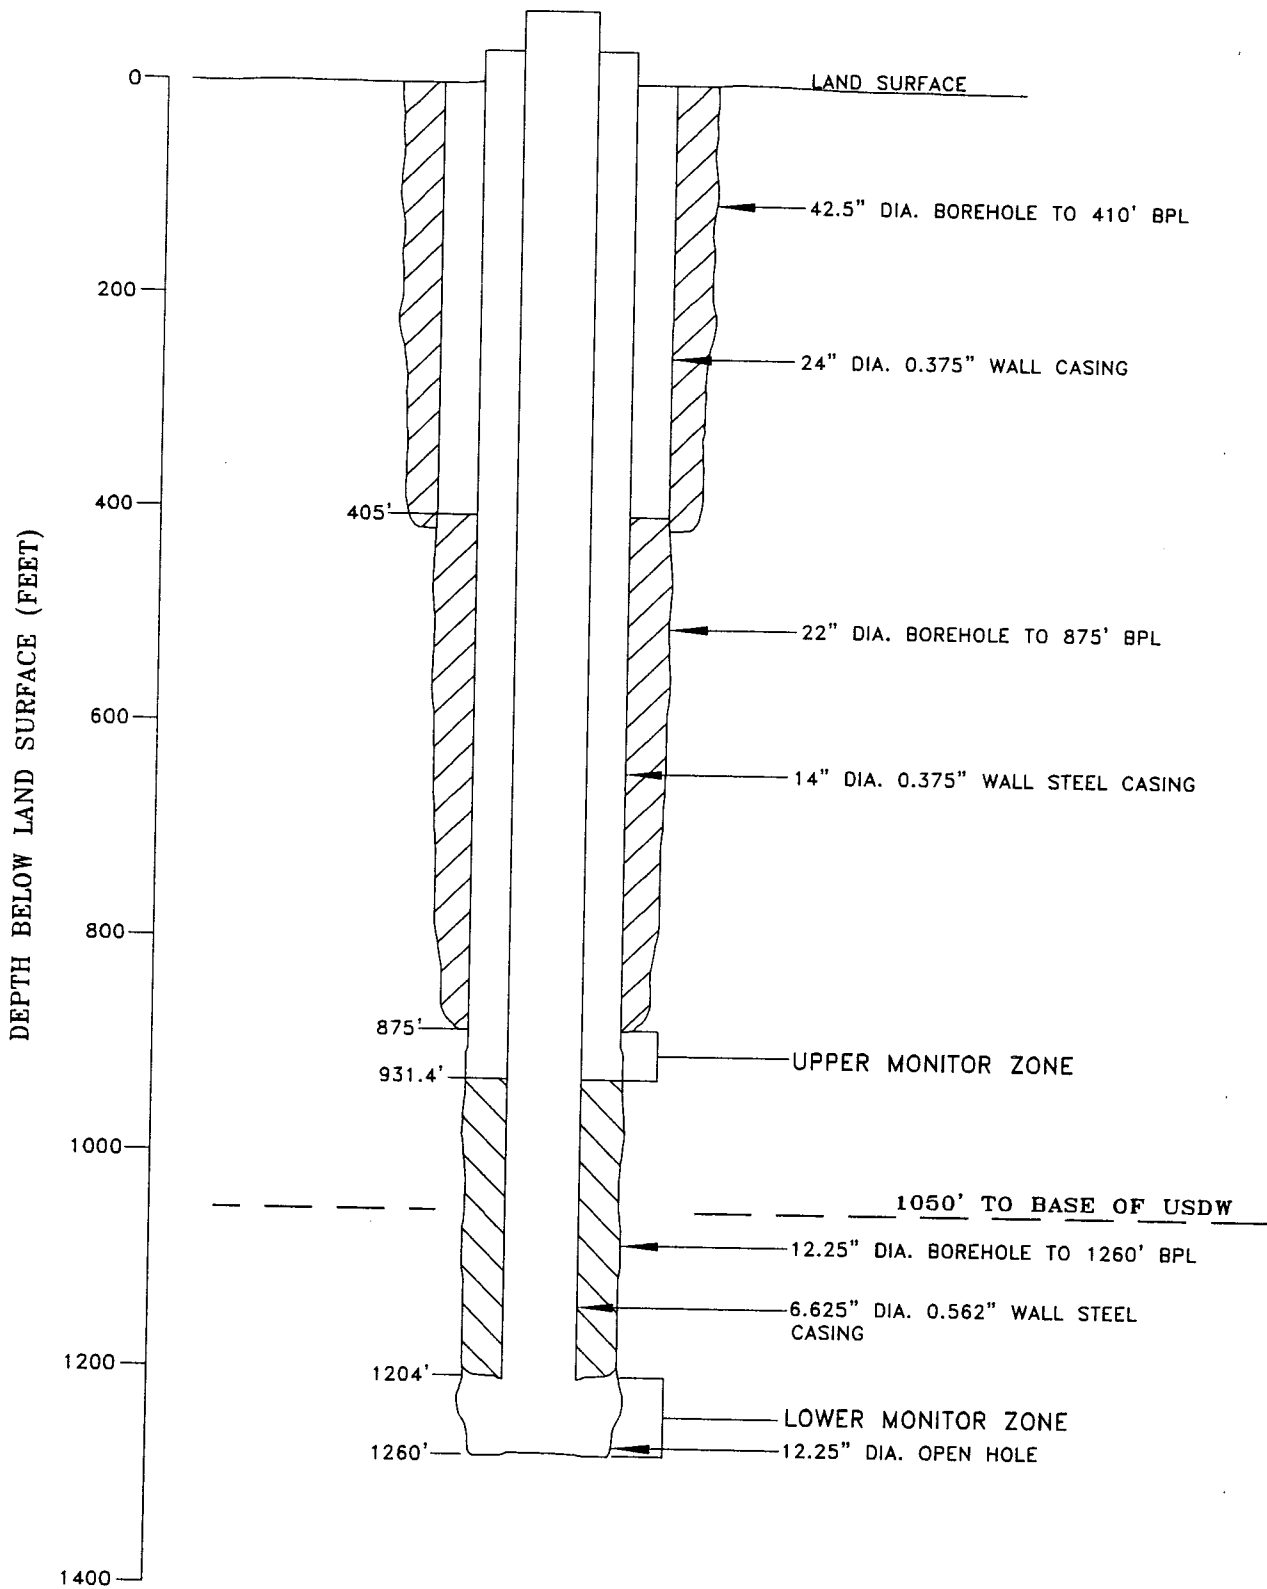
DZMW WELL CONSTRUCTION DETAILS.
